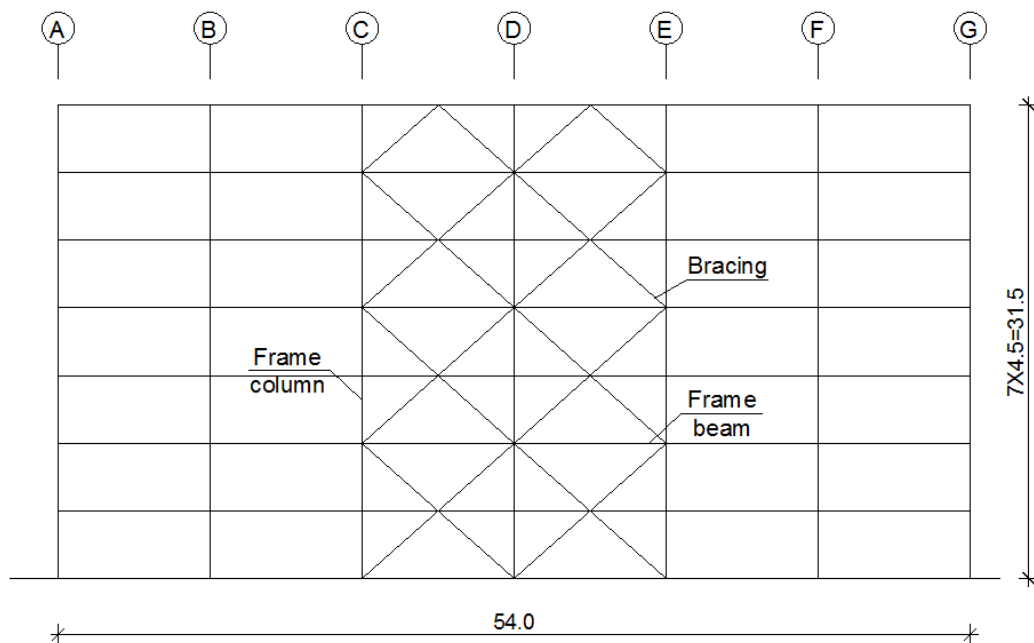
Model building elevation - 7-story CBF, $q = 1.5$
